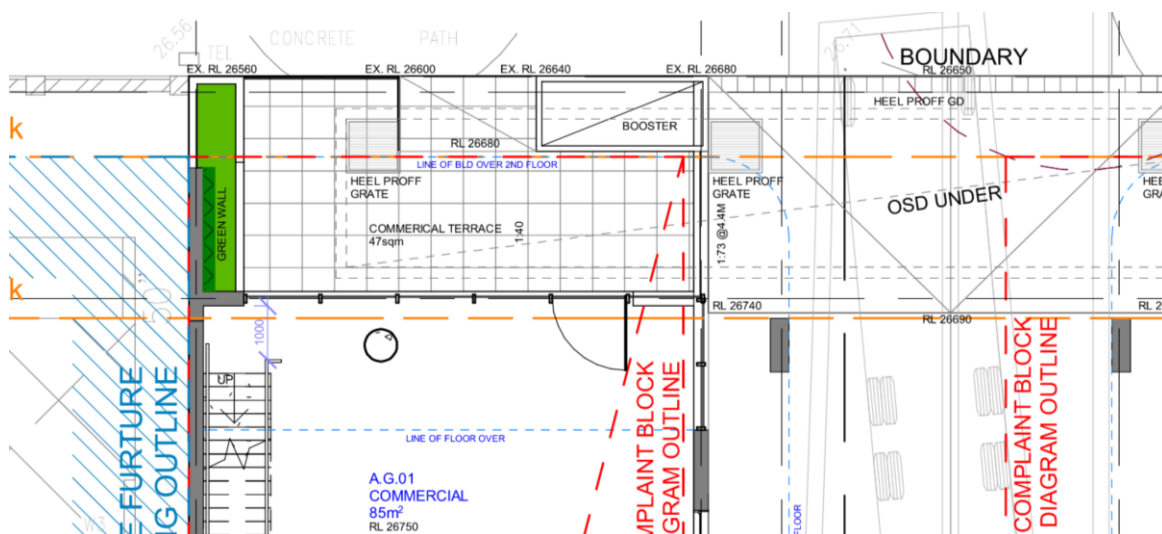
Extract of proposed ground floor plan (Source: D-Studio Architects)
